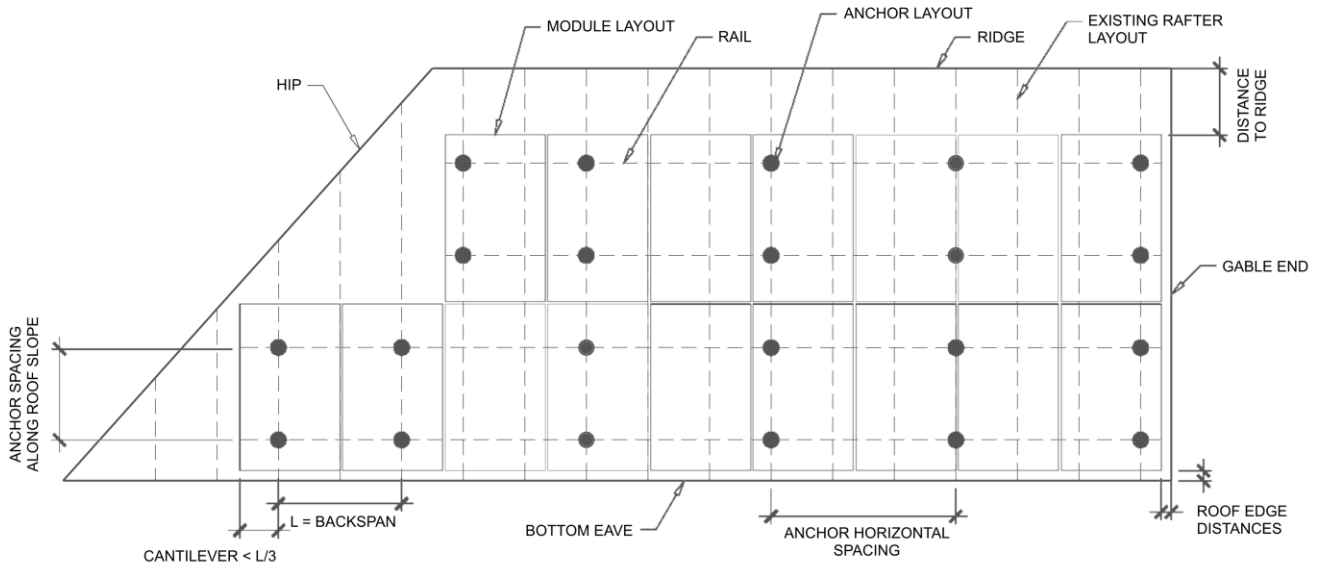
SAMPLE SOLAR PANEL ARRAY AND ANCHOR LAYOUT DIAGRAM (ROOF PLAN)
